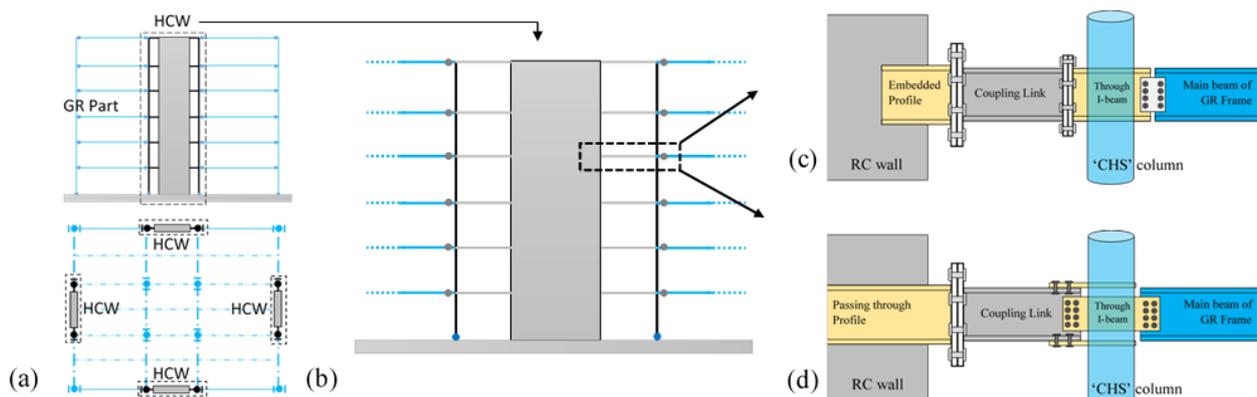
(a) Plan view and floor geometry of a 6-storey frame structure with positions of the HCW systems (b) schematic diagram of the HCW system, (c) an example of the “partly embedded” (denoted as WC-1) link-to-wall connection and the “through beam” (denoted as CC-1) link-to-CHS column connection, and (d) an example of the “passing-through” (denoted as WC-2) link-to-wall connection and the “through plates” (denoted as CC-2) link-to-CHS column connection.
